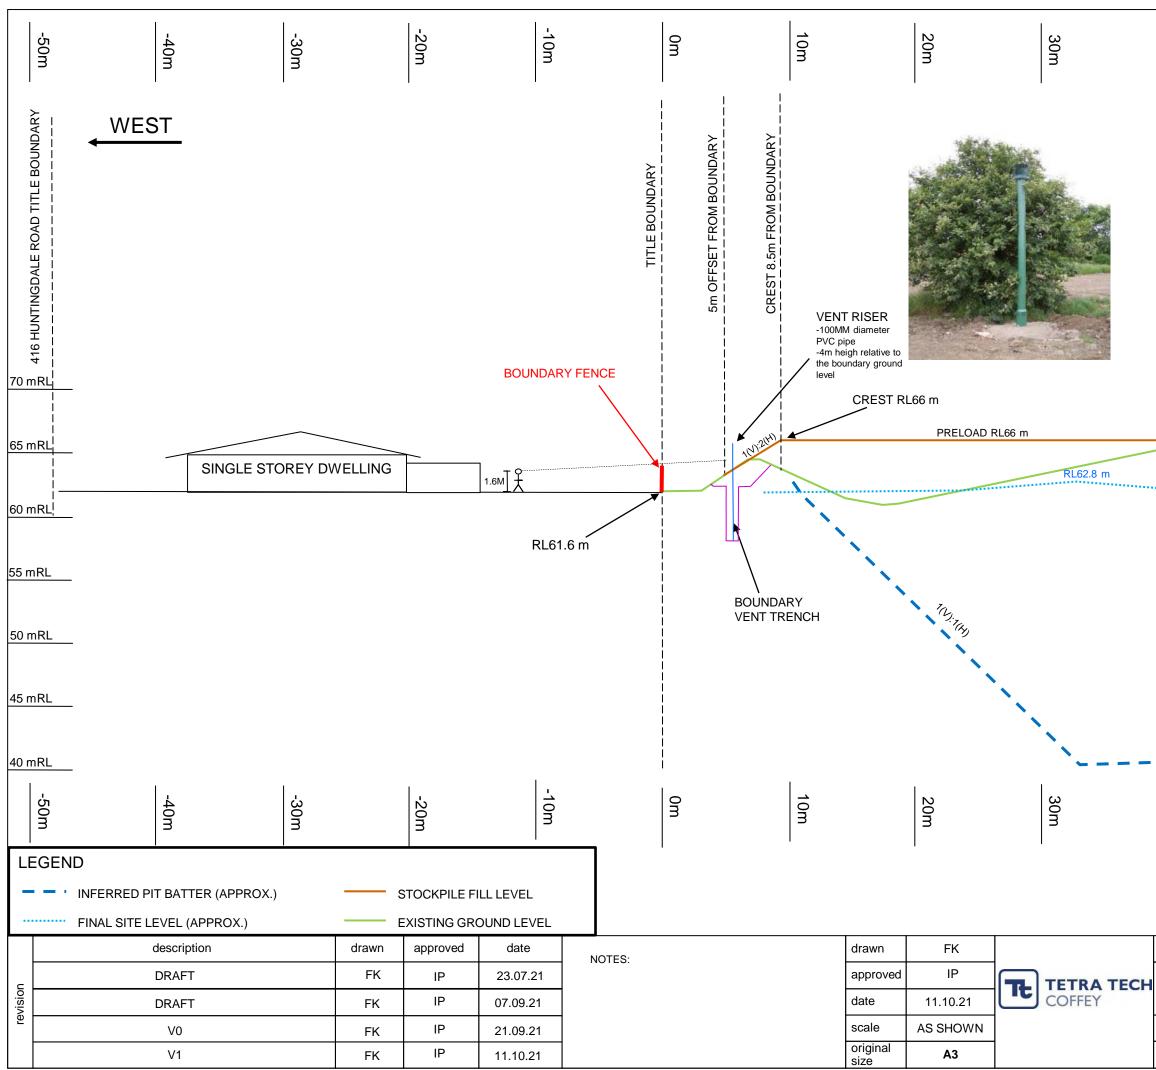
420 HUNTINGDALE ROAD CROSS SECTION
